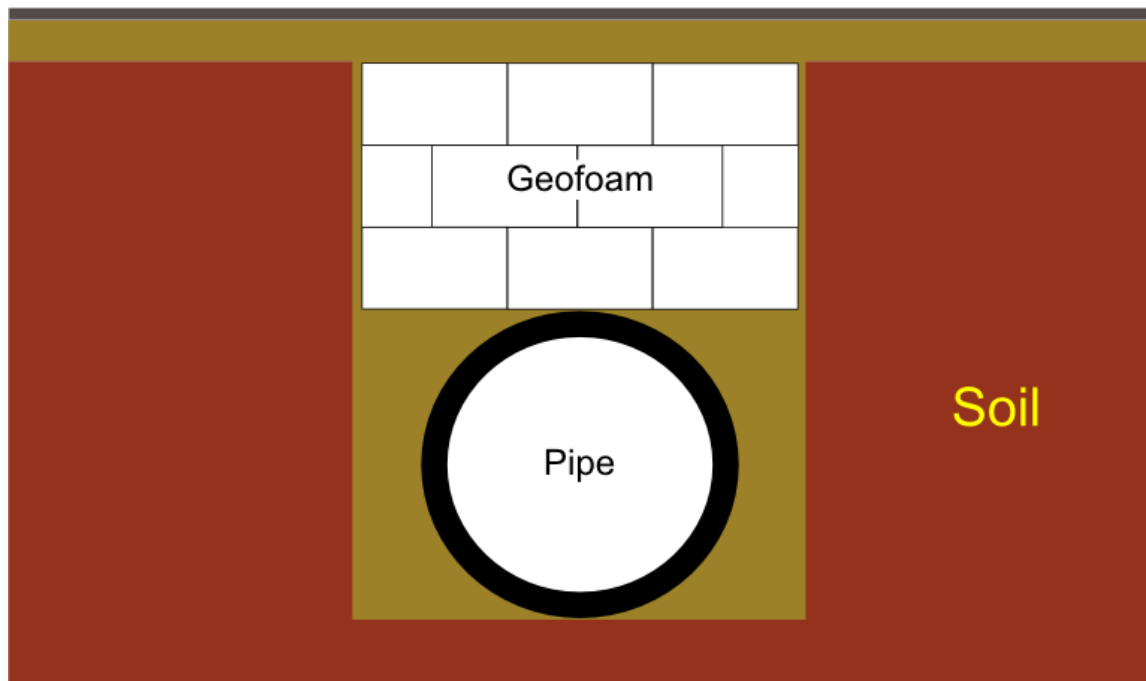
EPS geofoam implemented as a compressible inclusion between the ground surface and a pipe or culvert.
